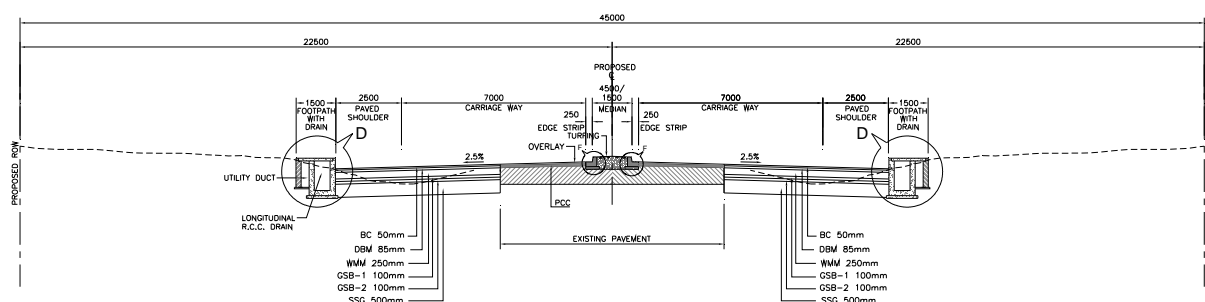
TYPICAL CROSS SECTION FOR CONCENTRIC WIDENING WITH 1.5m SIDE WALK ON BOTH SIDES & 1.5m MEDIAN
